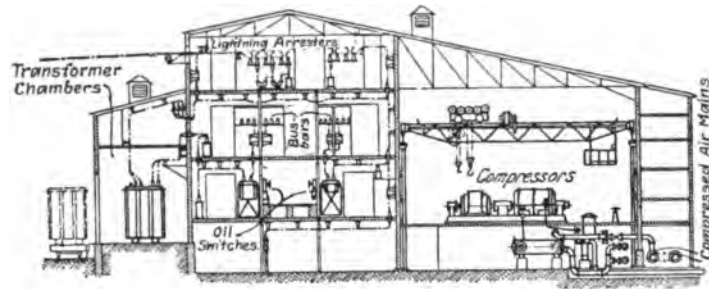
Robinson Central Station. Section through the Switch House and Engine Room.
